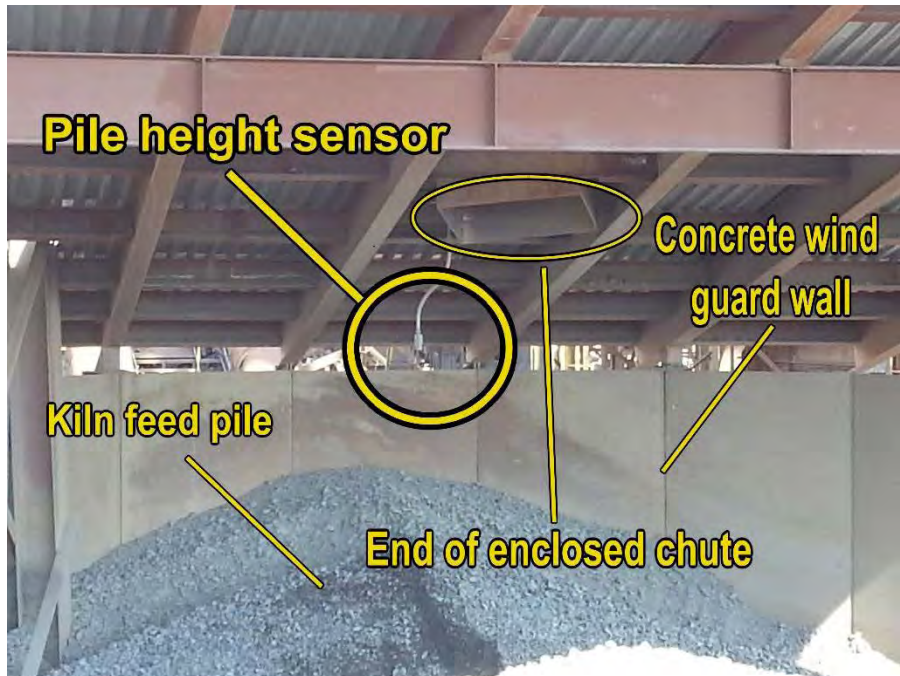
Close-up on back wall, chute, and height sensor that hangs above kiln feed pile. Note the limited accumulation of dust on the wall and roof structure.
